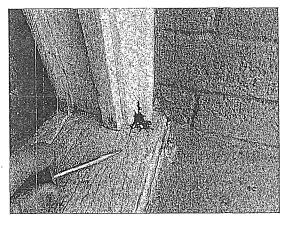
Detail photograph of typical deterioration at window trim (Photograph was taken on 02/27/2018).
